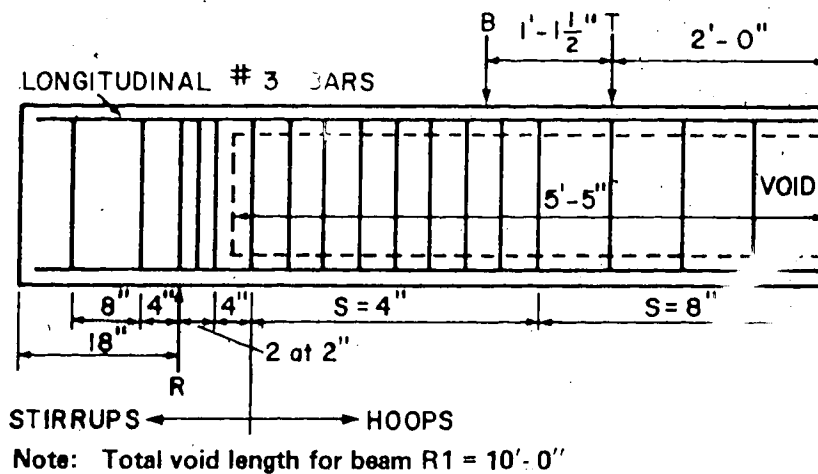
(A) REINFORCEMENT FOR BEAMS R1 AND R2
